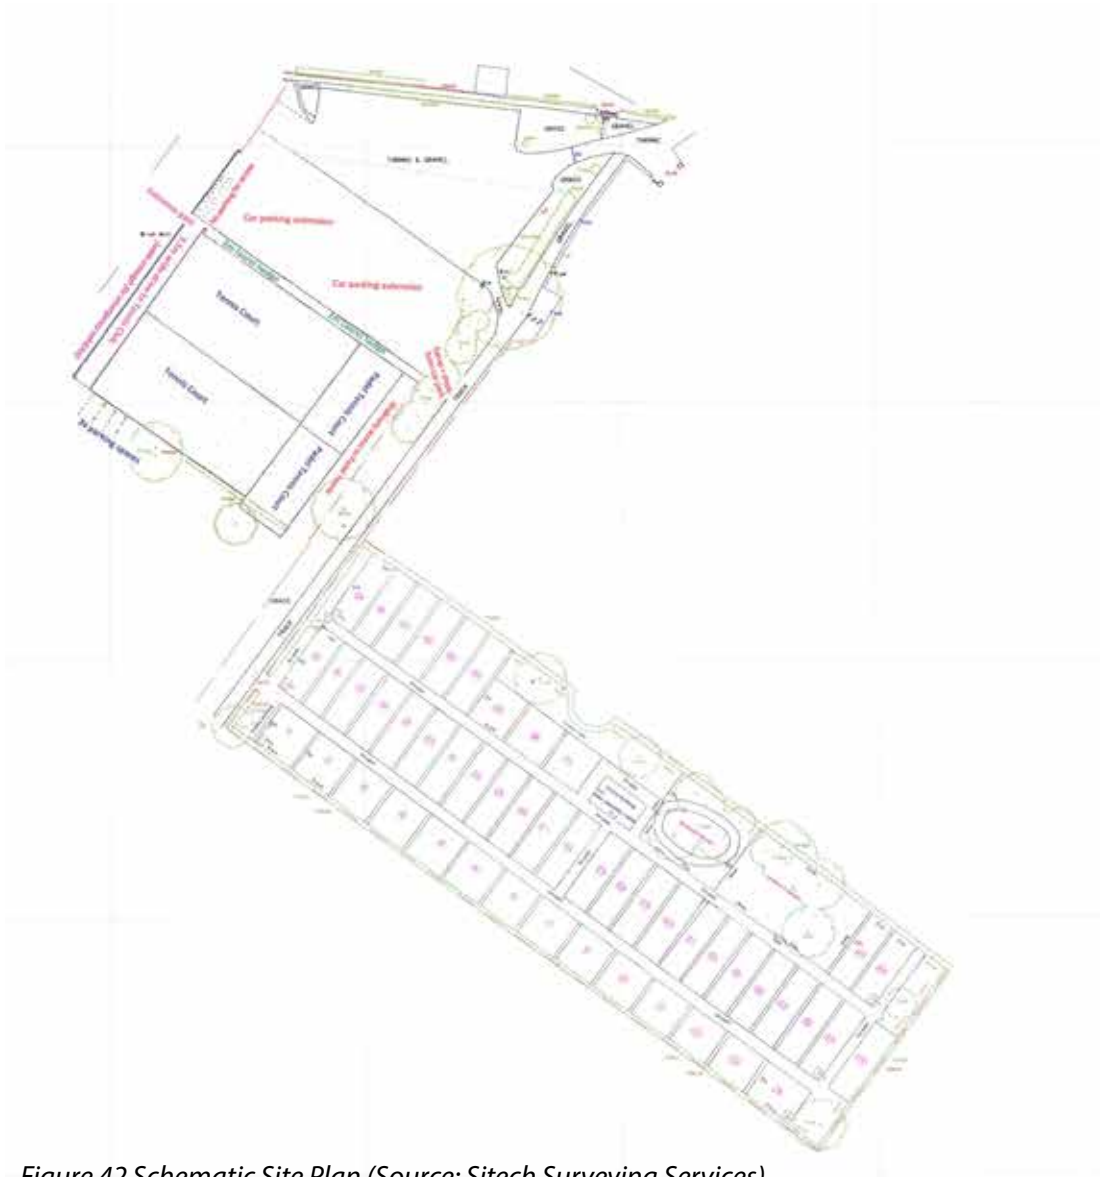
Schematic Site Plan (Source: Sitech Surveying Services)
